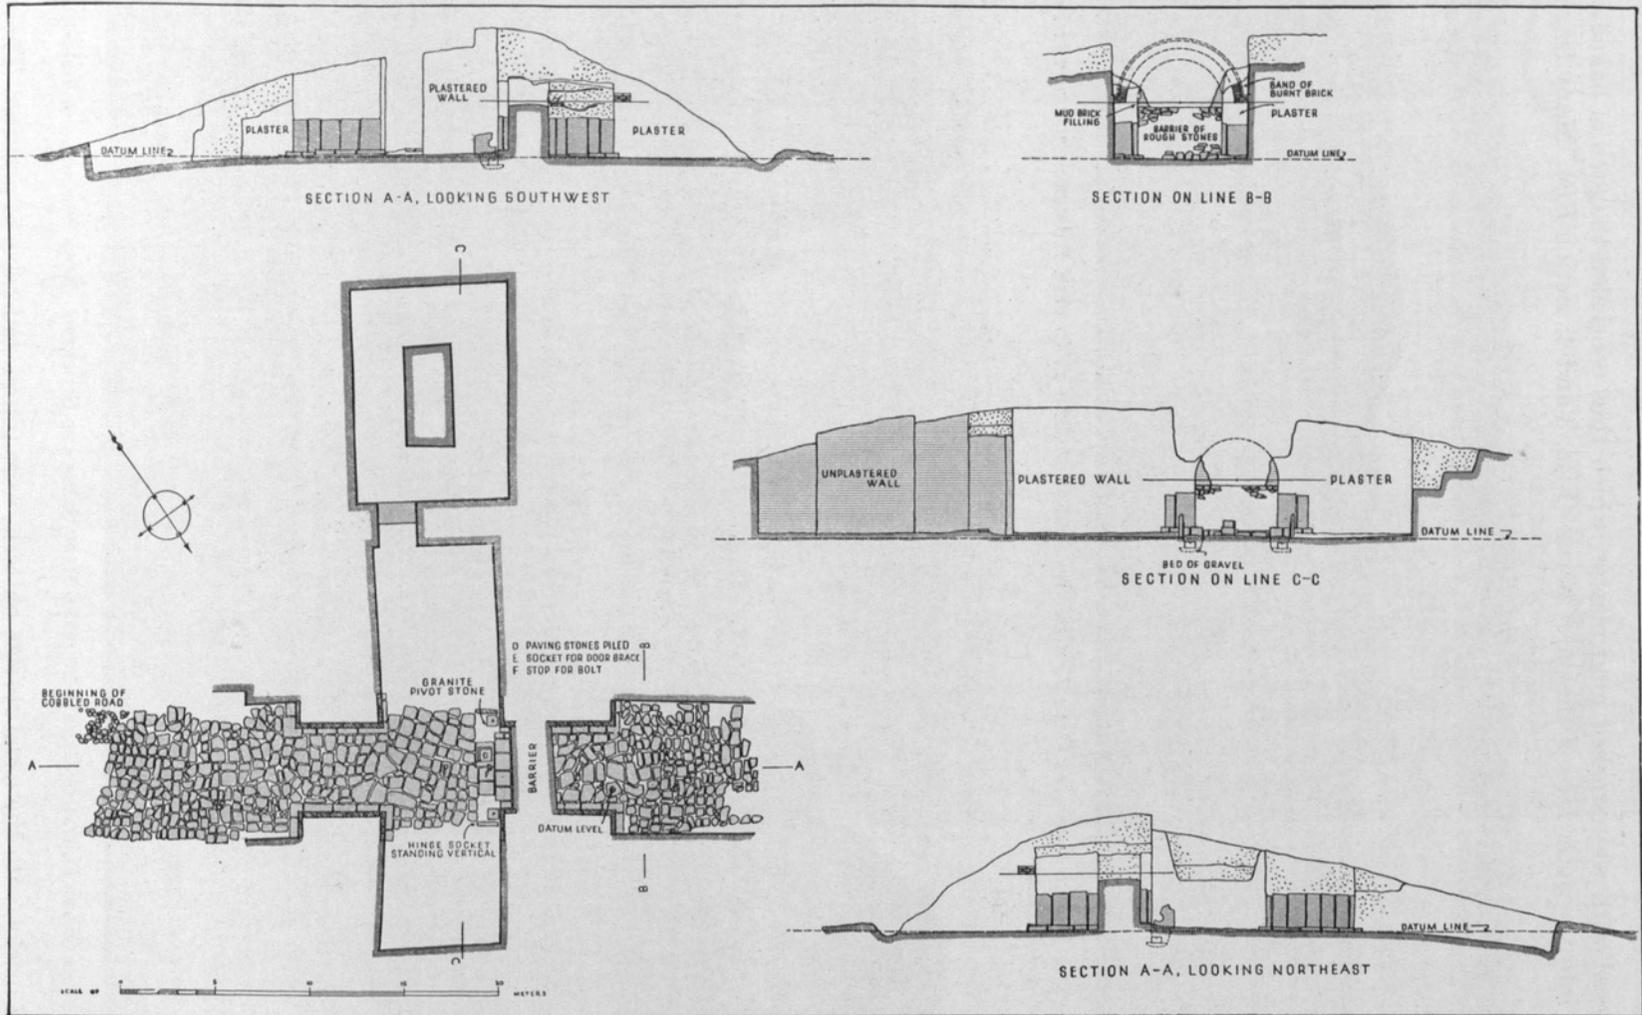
PLAN AND CROSS-SECTIONS OF GATE 7. SCALE, 1:400
